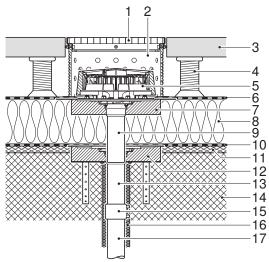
Installation in a solid roof insulated with vapour barrier and roof foil, suitable for parking decks
